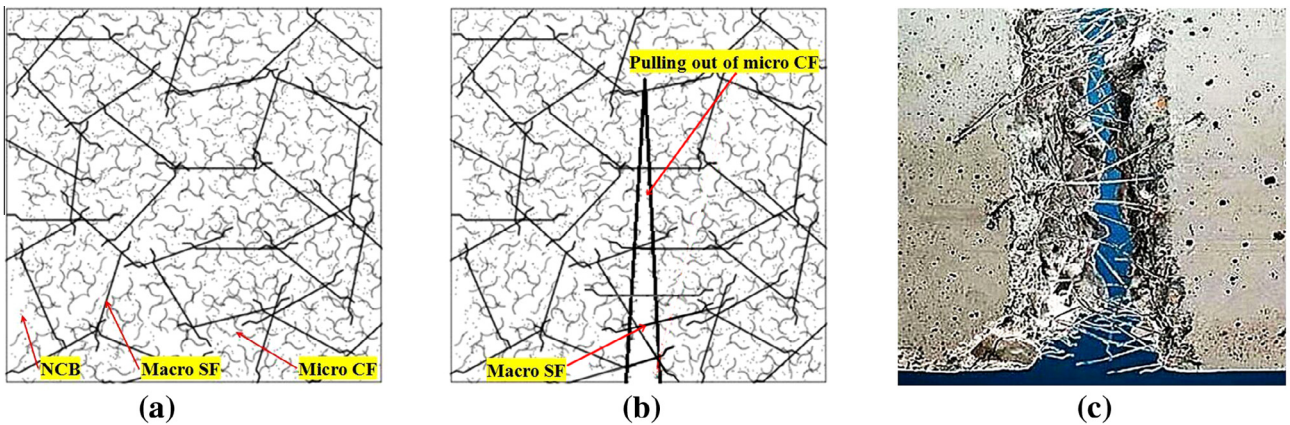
Conductive network of triphasic materials in the concrete matrix (a) before cracking, (b) after cracking, (c) Macro SF cross concrete crack.
